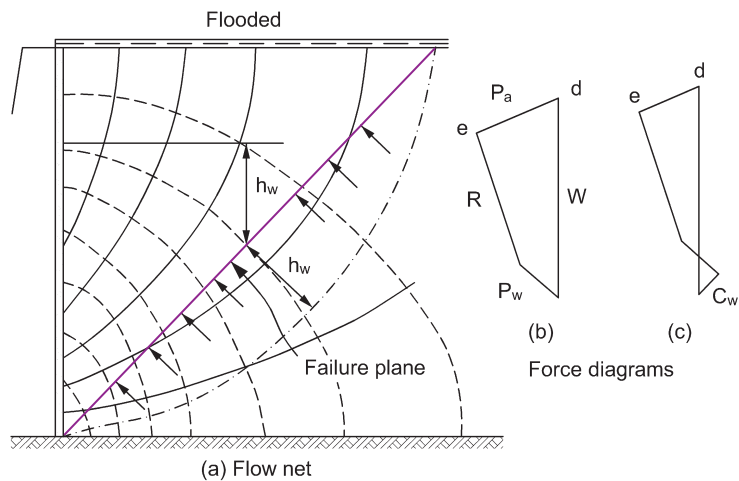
Seepage forces behind a retaining wall with a vertical drain during heavy rain.
